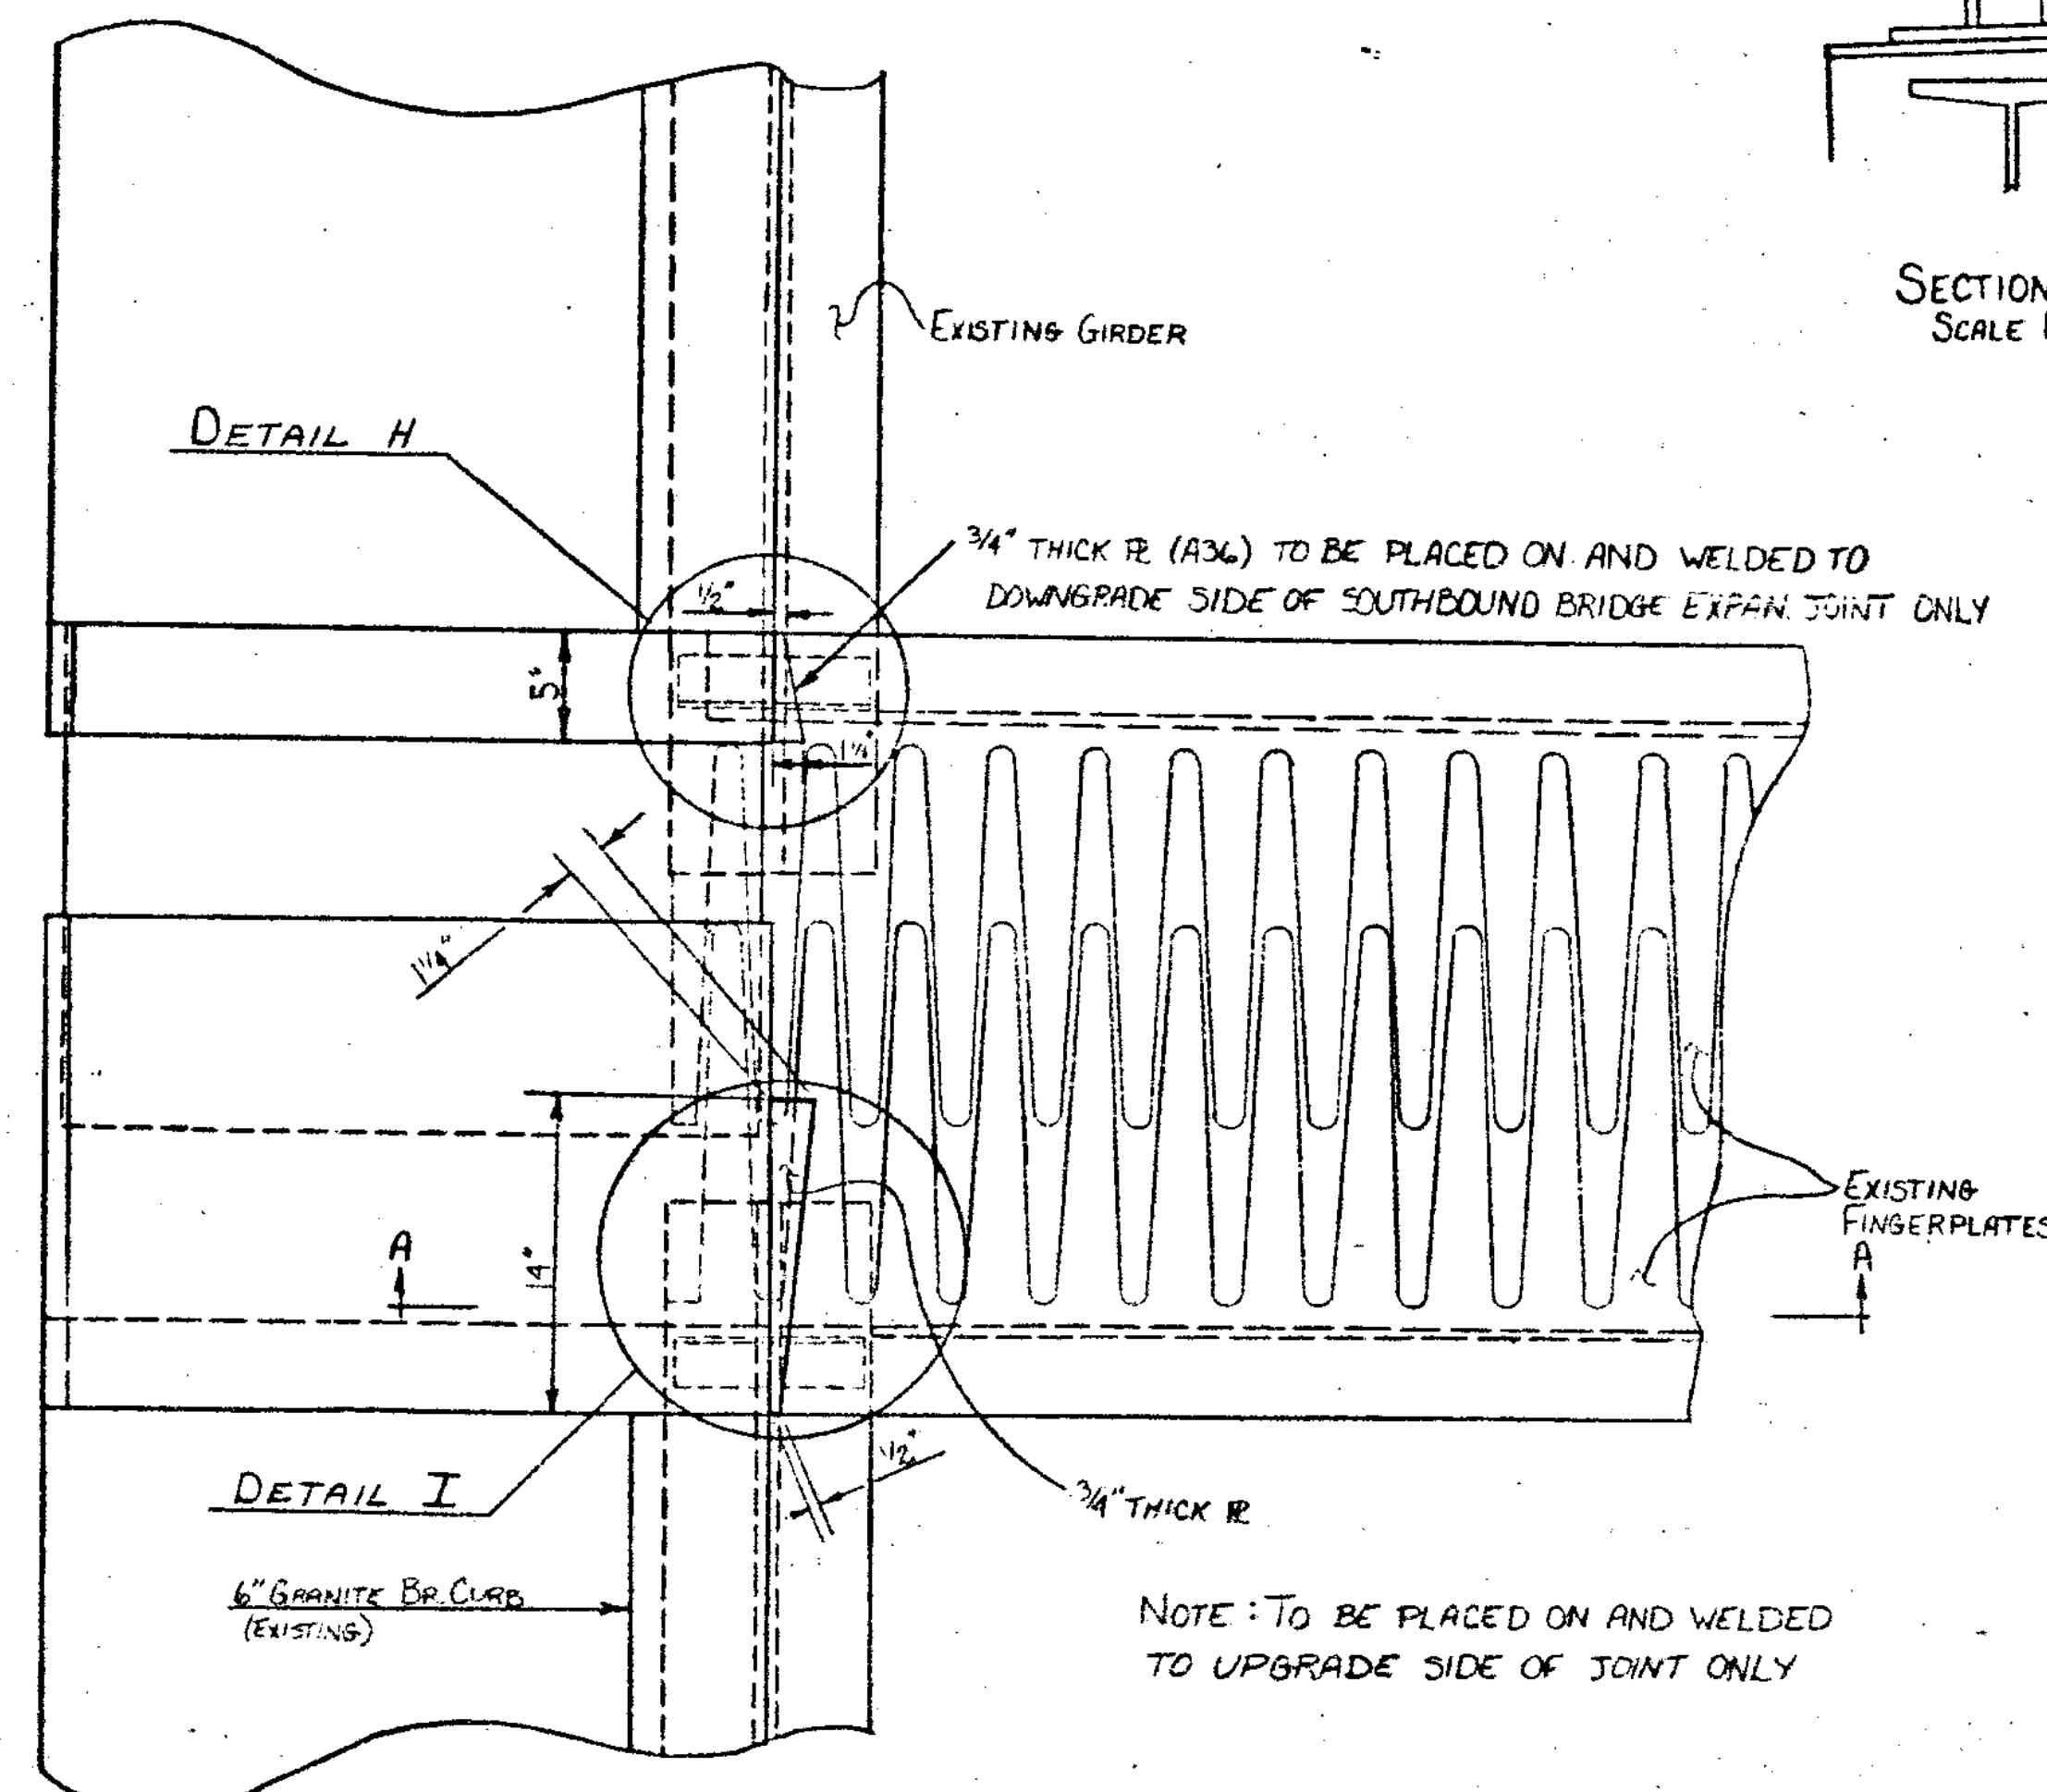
/4" R OVER EXISTING FINGERPLATES
